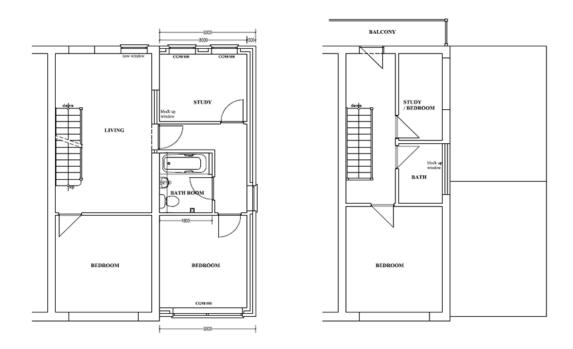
Proposed Second (left) and Third Floor (right) Plan
